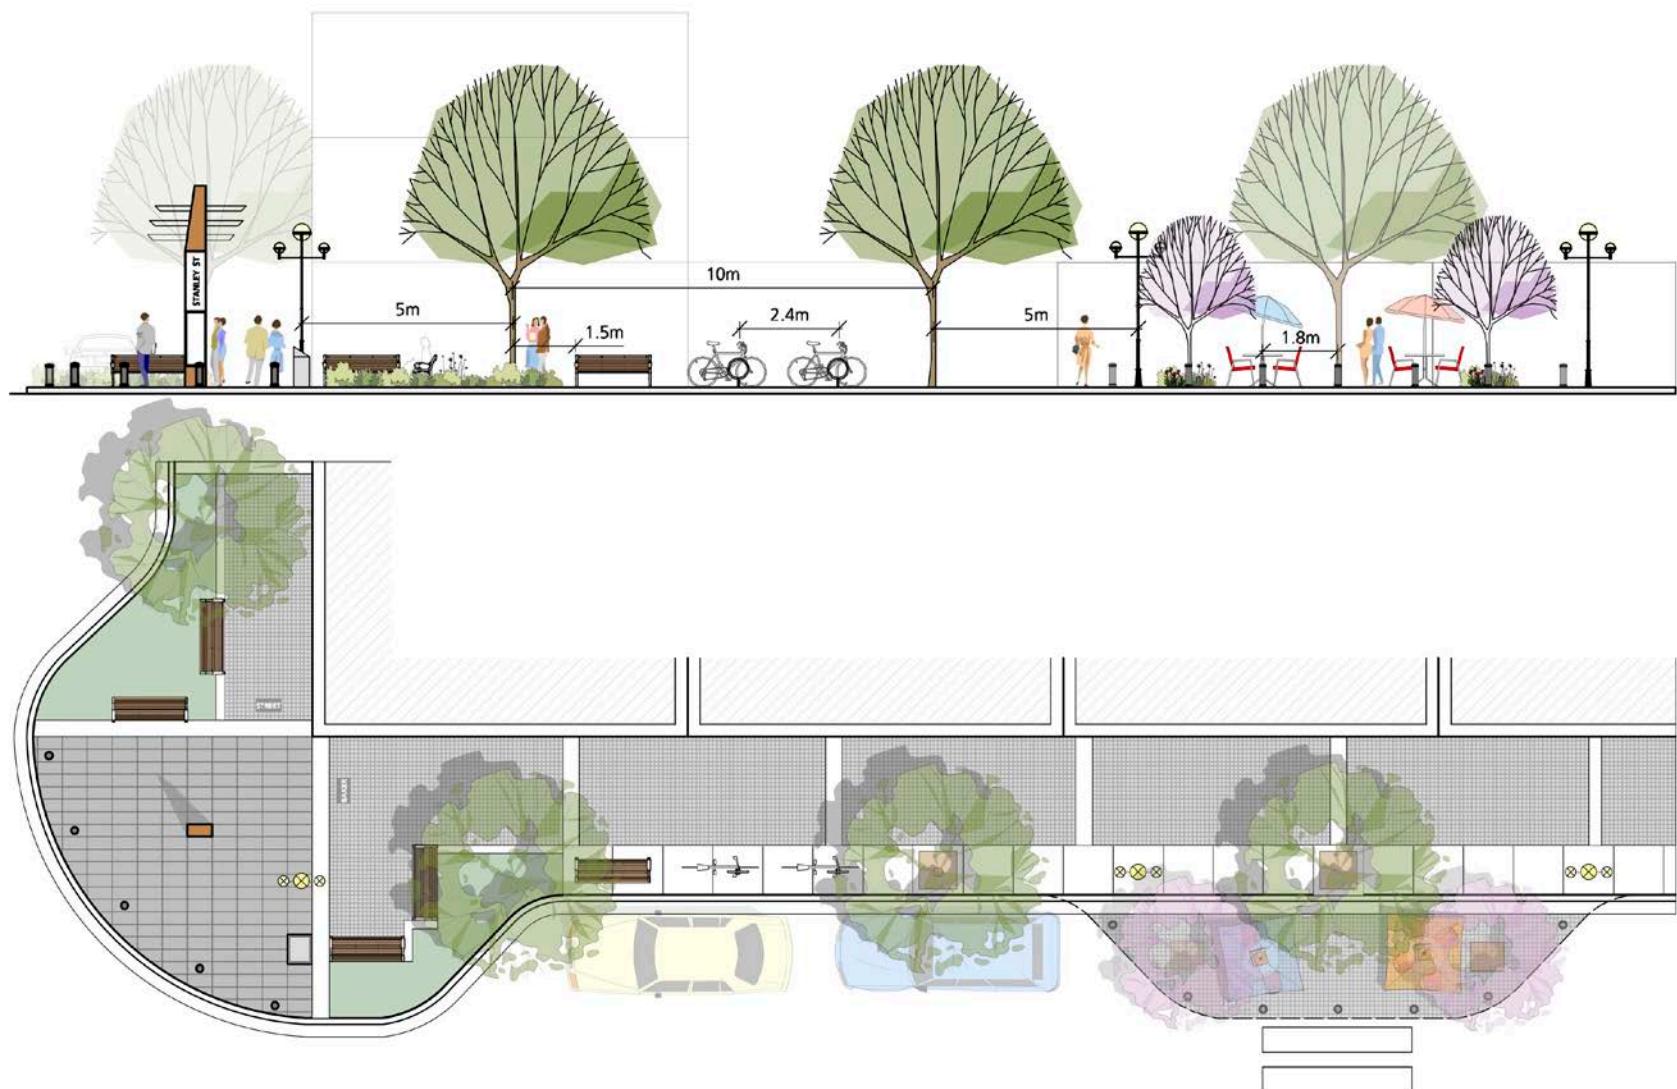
Example of a sidewalk in the downtown that shows placement of signage, street furniture, landscaping and lighting
